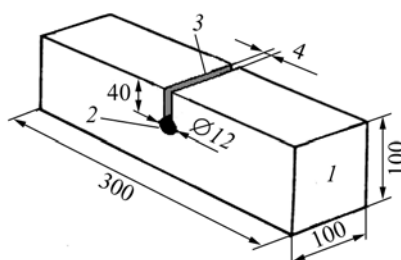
Scheme of the concrete sample for determination of reinforcement adhesion by bending test method: 1 – concrete prism; 2 – steel reinforcement rod; 3 – stress concentrator.
